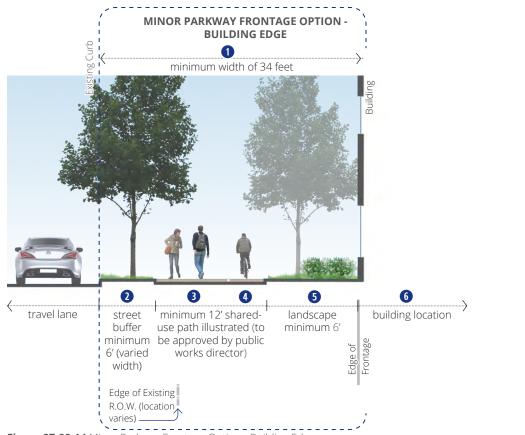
Minor Parkway Frontage Option - Building Edge
